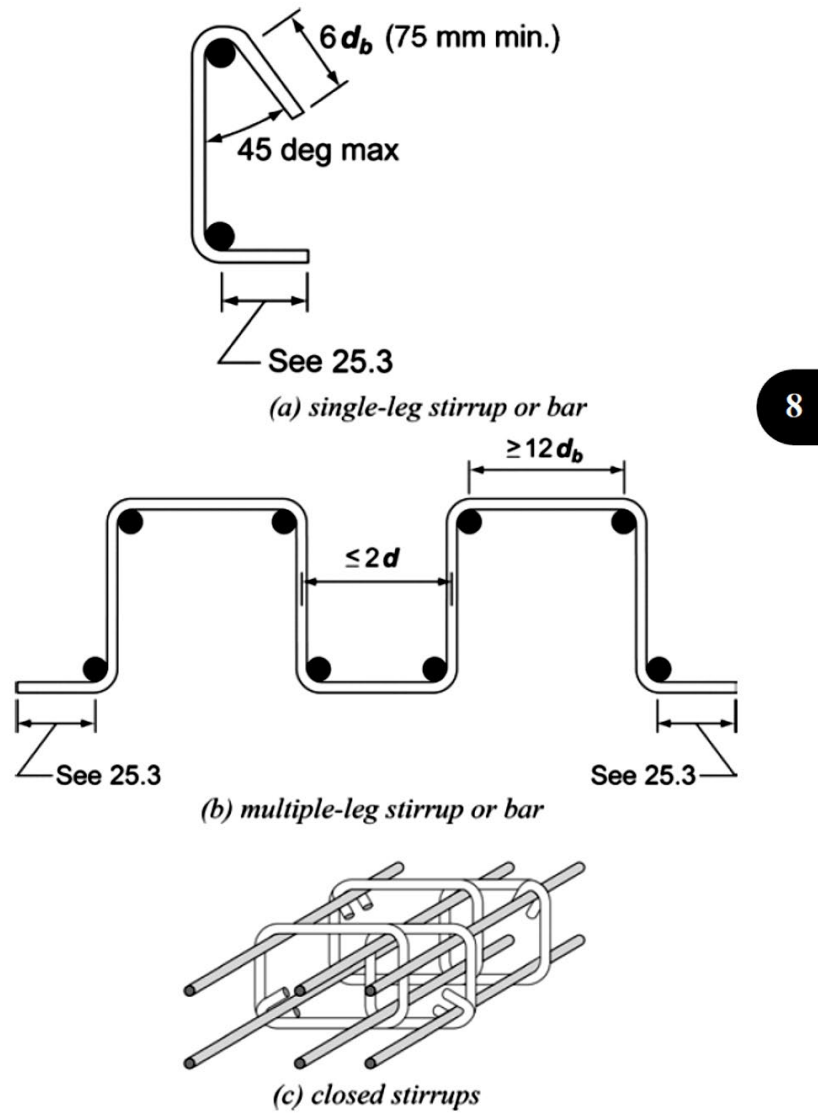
(a)-(c)—Single- or multiple-leg stirrup-type slab shear reinforcement.
